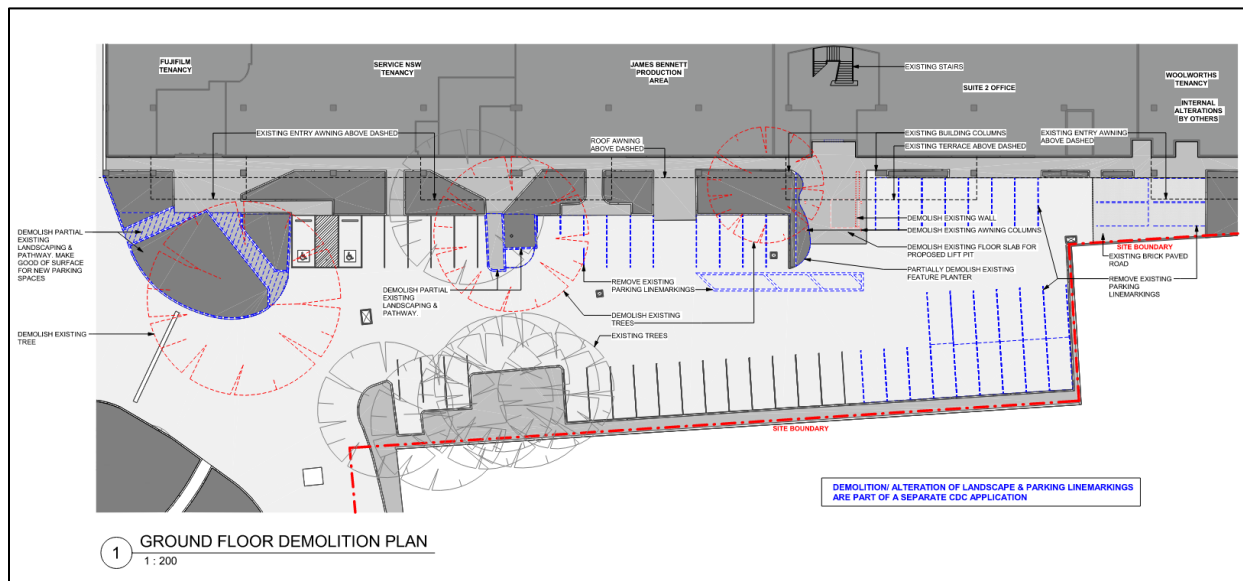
Demolition Plan (Source: Reid Campbell, 2024)
